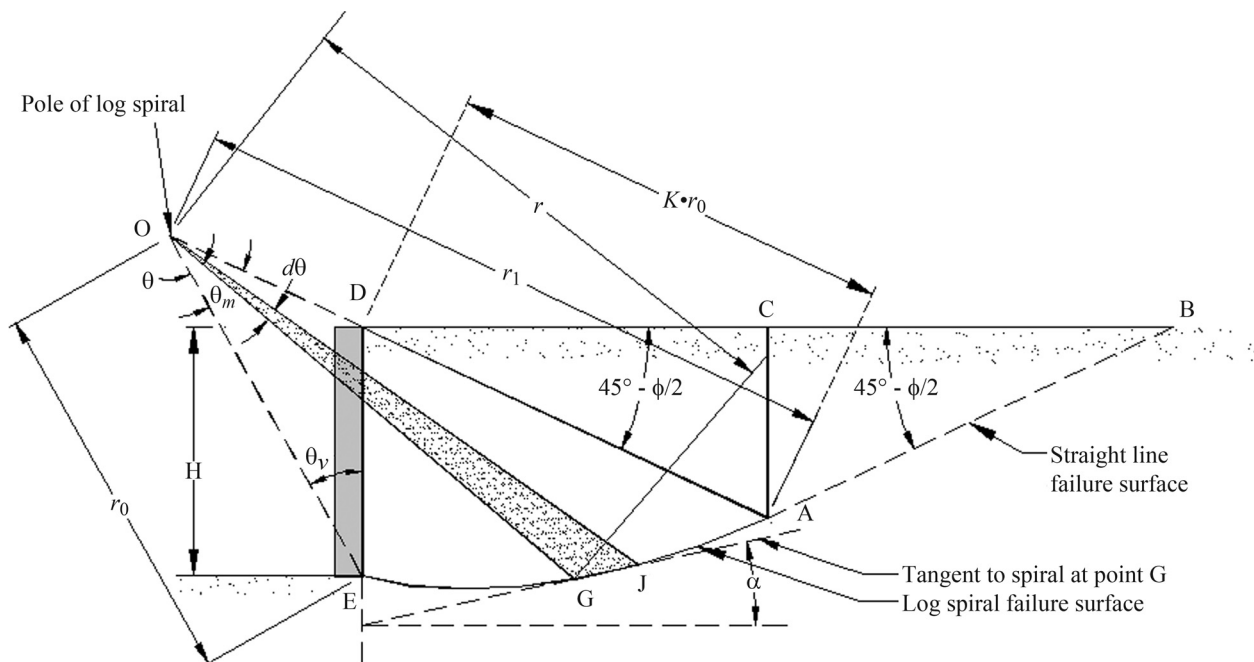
Retaining wall with a horizontal cohesionless backfill - failure mechanism.
